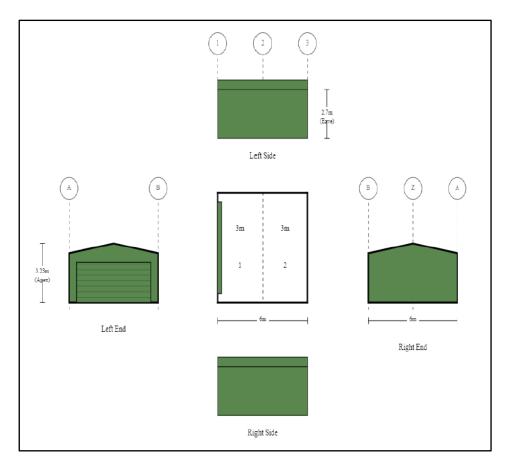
Proposed Garage Plans (The Shed Company, 2024)
